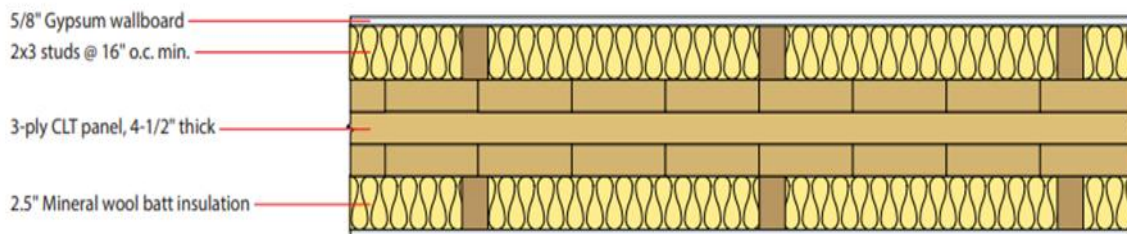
Batt insulation for noise barrier for CLT wall (Woodworks, 2018)
